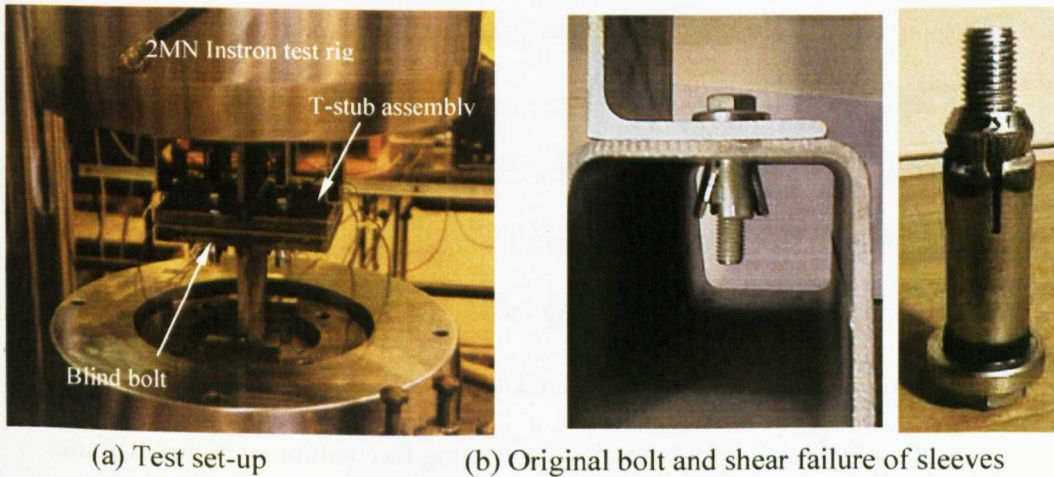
Representative tensile test of blind bolted (Lindapter Hollobolt) T-stub assembly (Barnett, 2001)
